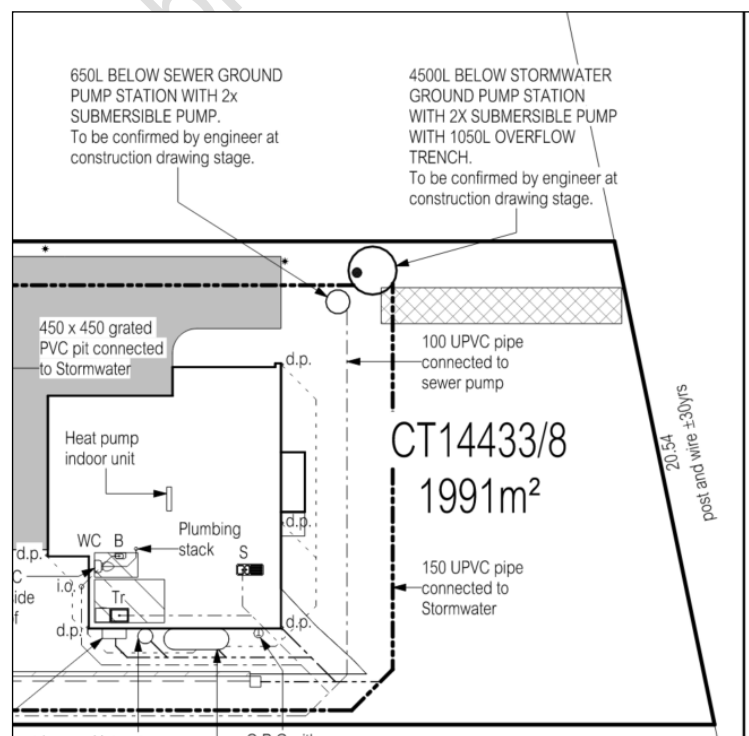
extract from ground floor drainage plan showing location of stormwater tank and pump
